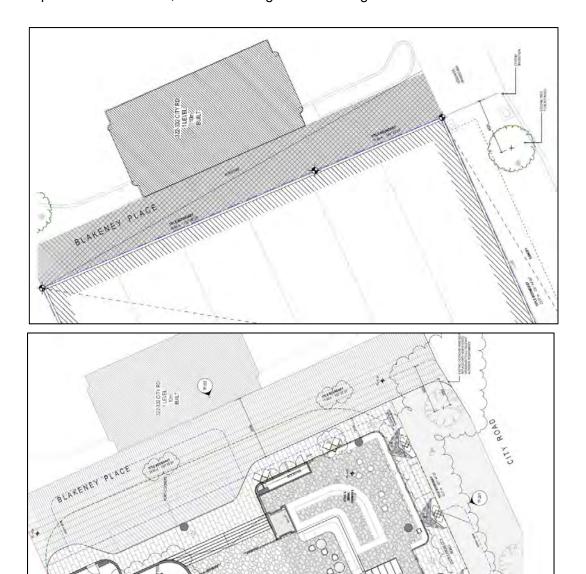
Existing and proposed arrangement for SM0199 (Source: Applicant)
